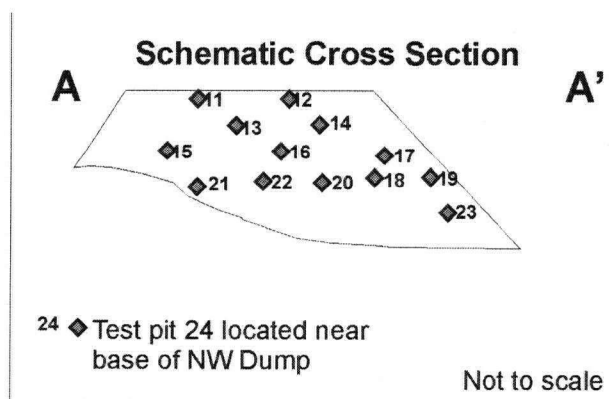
Section View of Waste Rock Pile showing Test Pit Locations at Site 2
